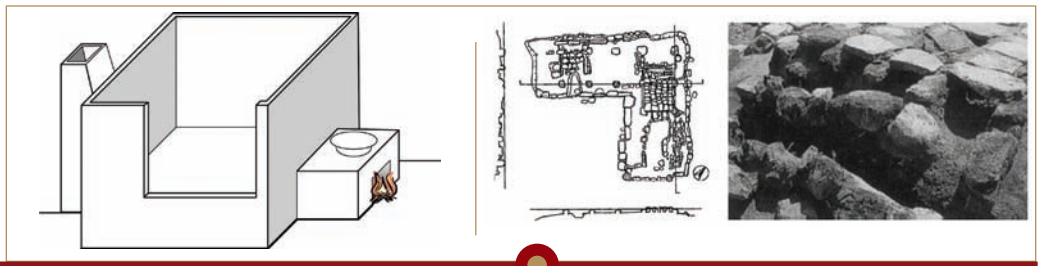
Entirely ondol floored room dating from the Chosun Dynasty. Left – agungii (furnace); center – bang (room); right – gulduk (chimney).
